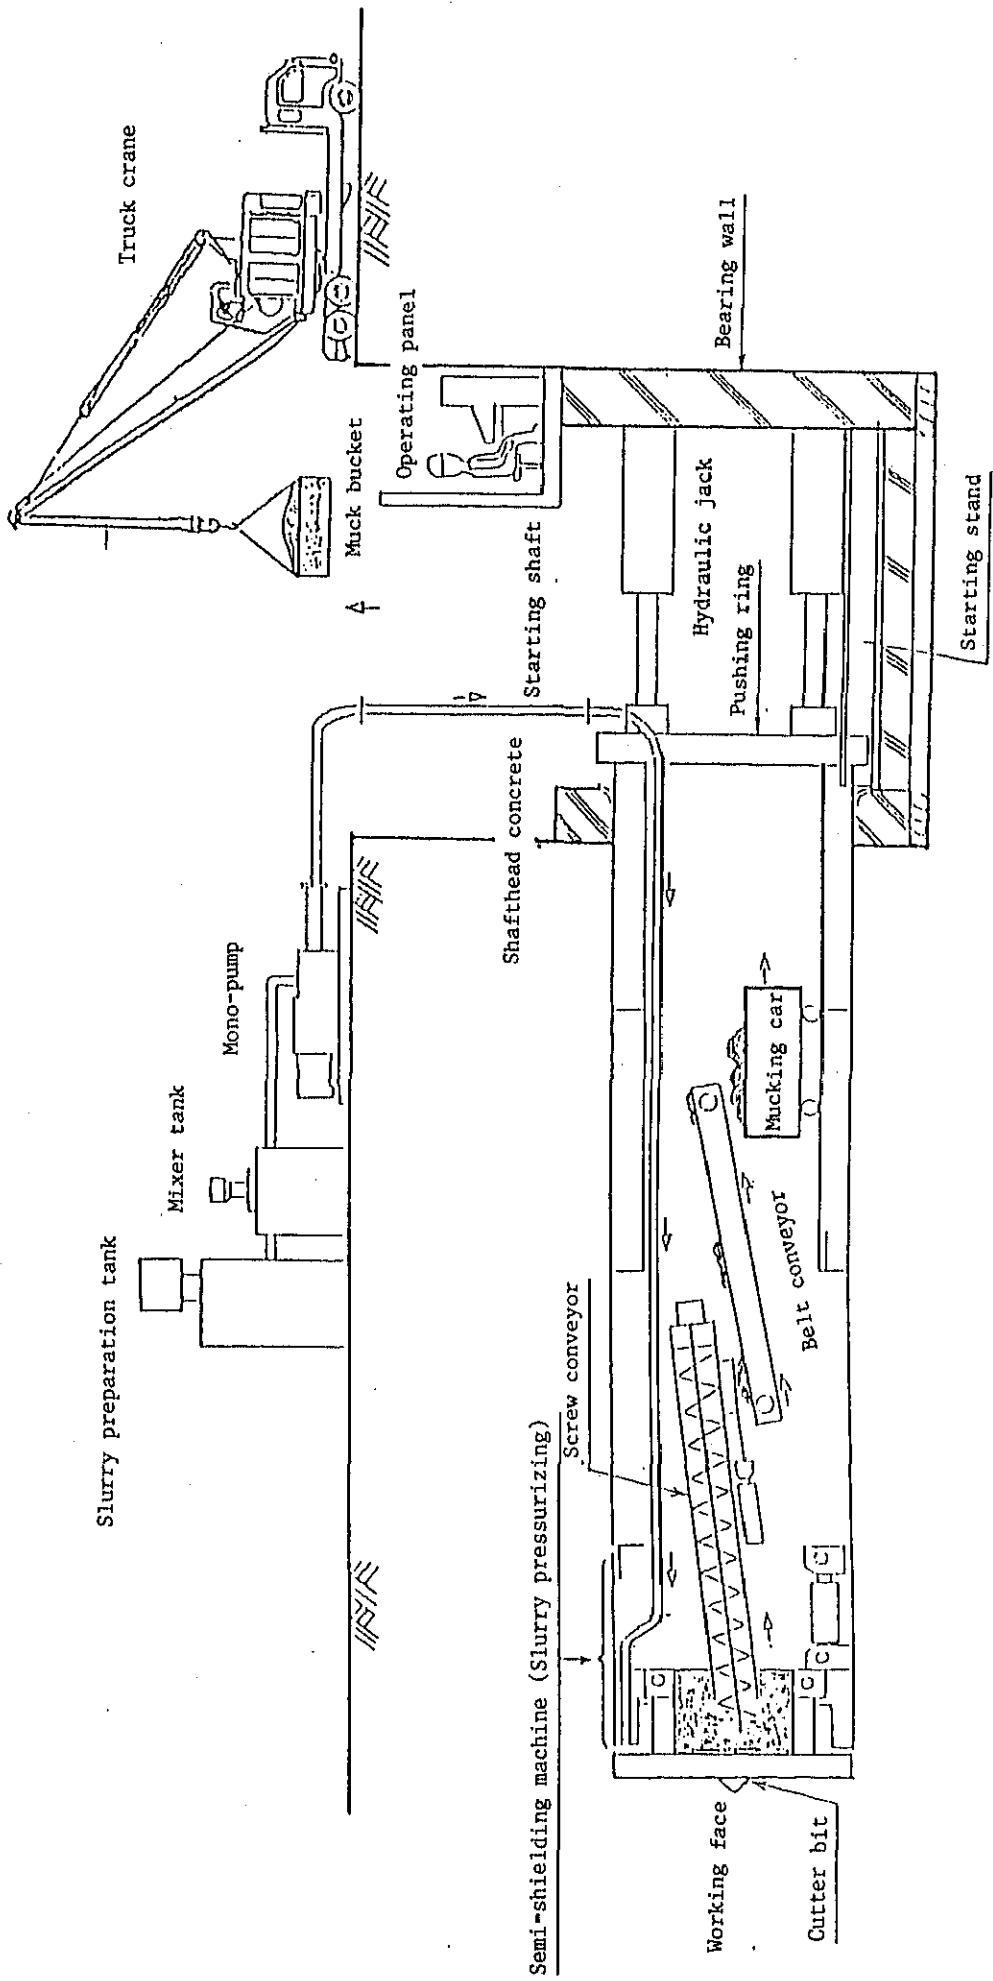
Outline of Jacking Machine for Slurry Semi-shield Method
